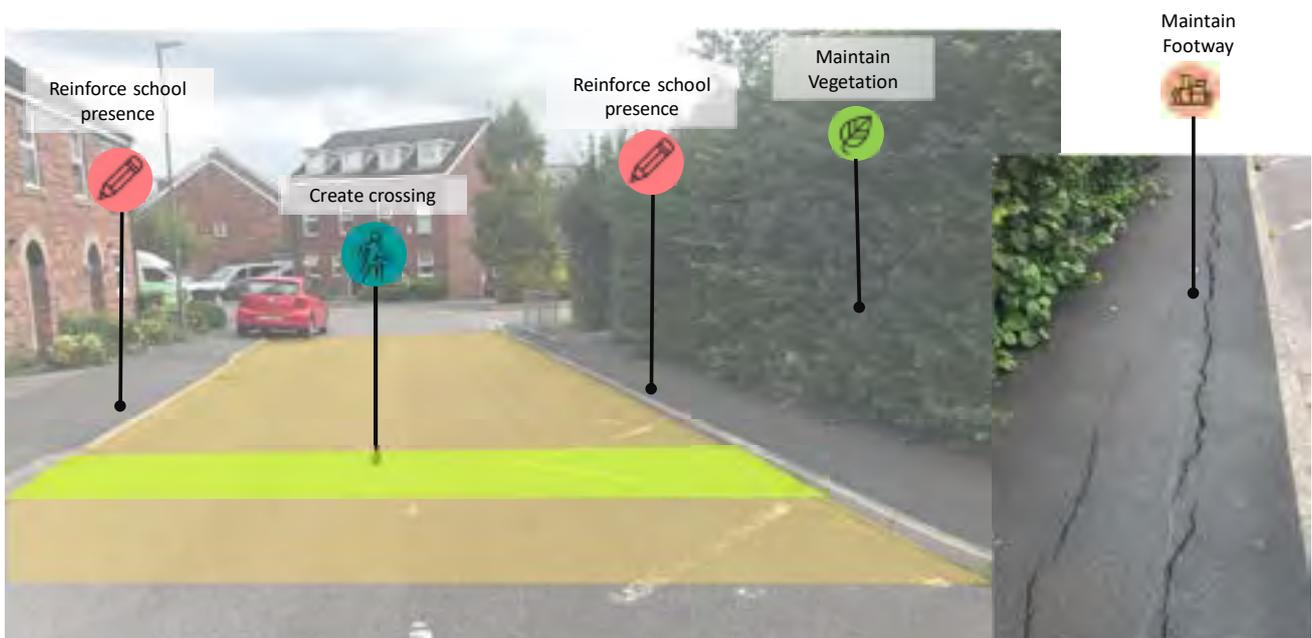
5. Improving the route and crossing to Park Road from Herbert Strutt Primary School
